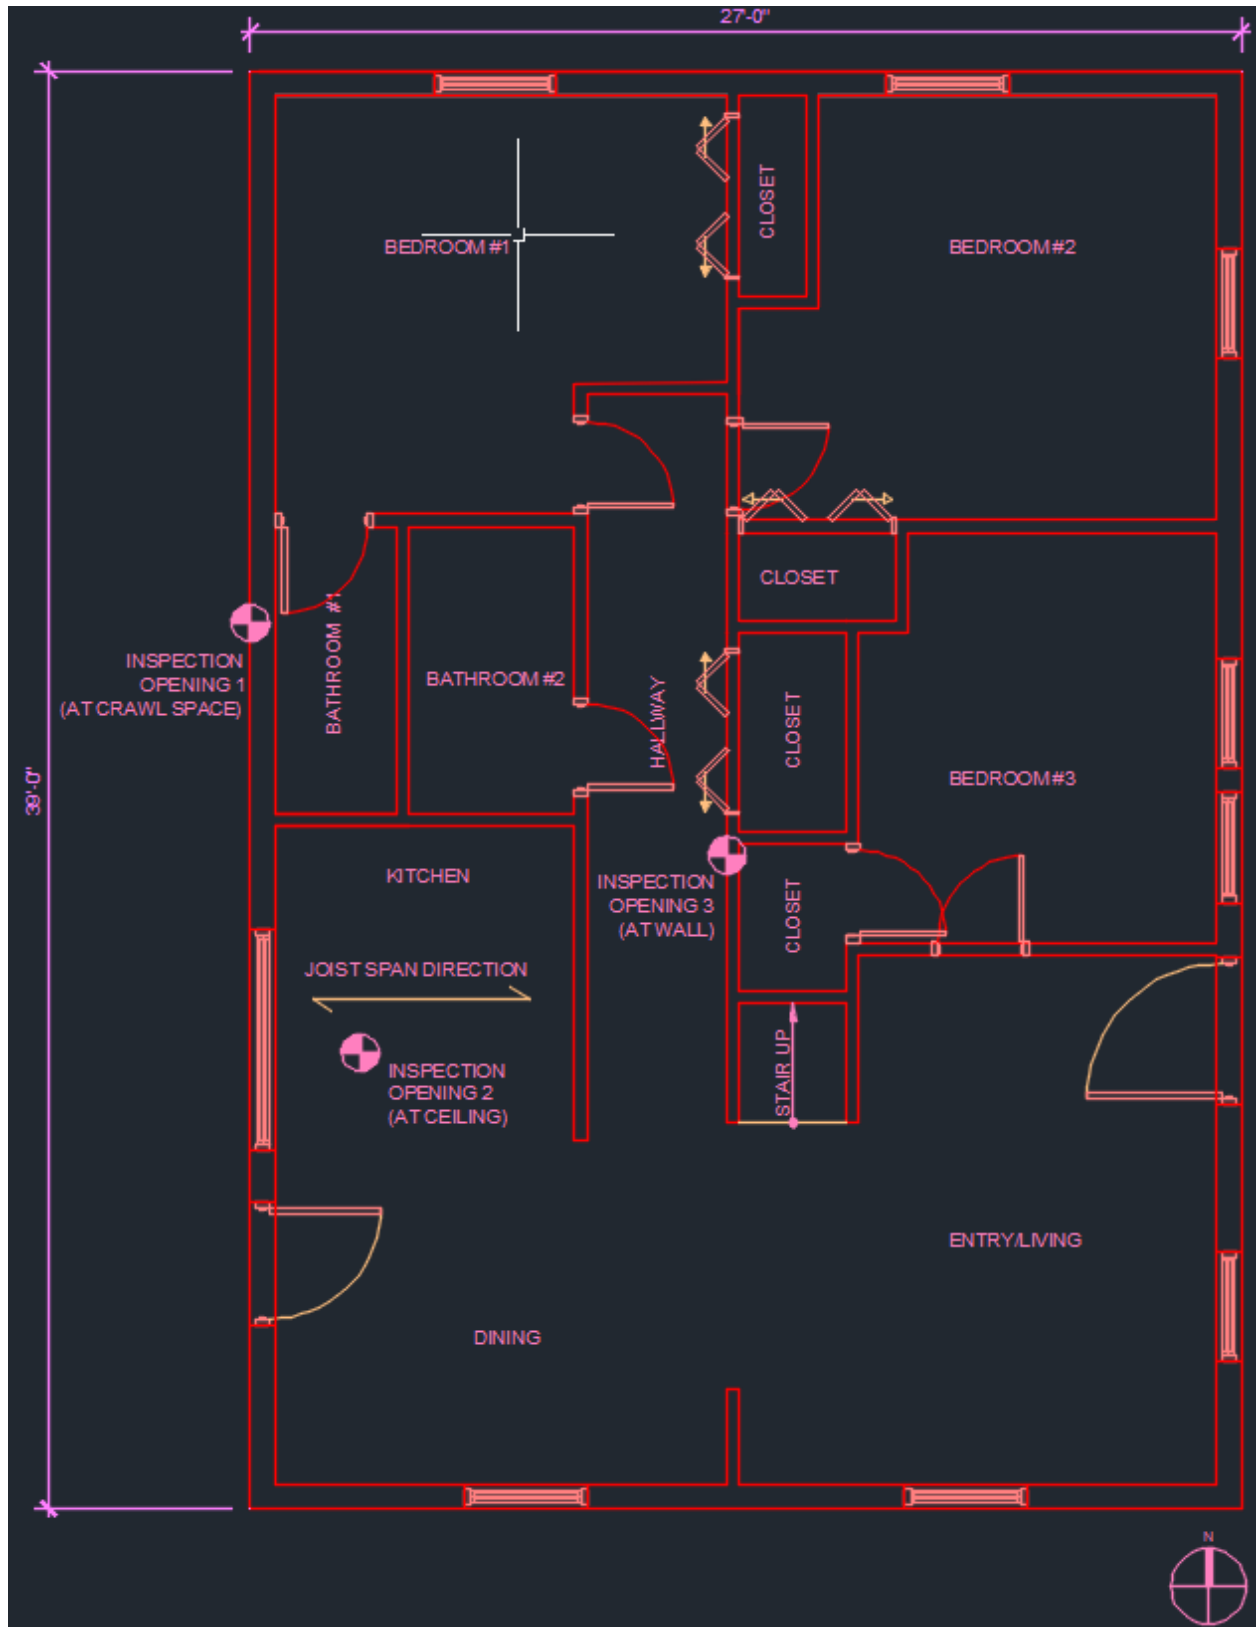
First Level plan indicating approximate inspection opening locations and building configuration.
